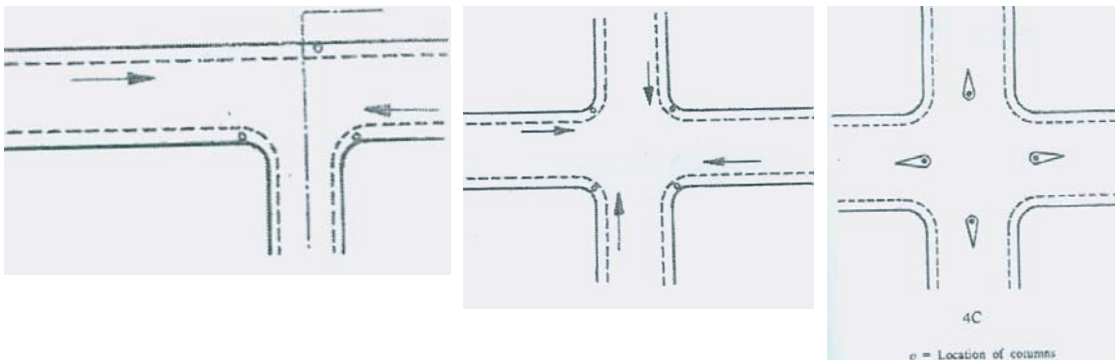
Lighting layout of Sample two road Junctions (Three Alternatives)
